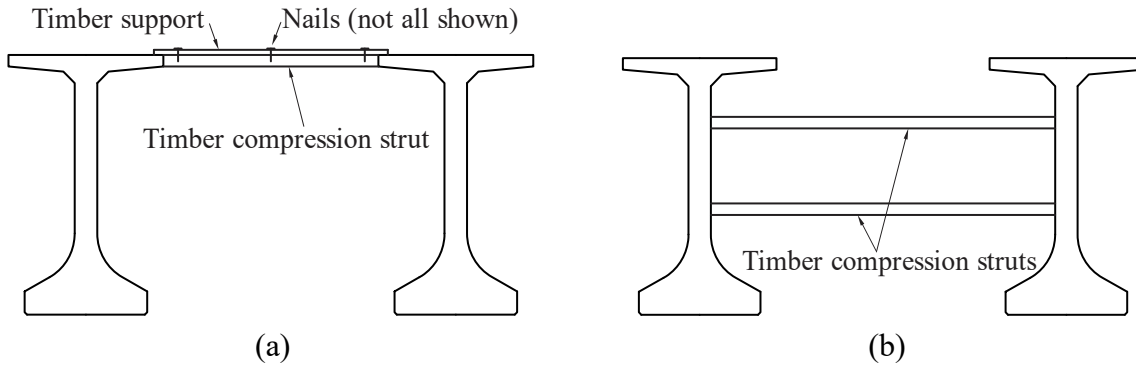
Examples of strut bracing: (a) Top strut; (b) Parallel struts
